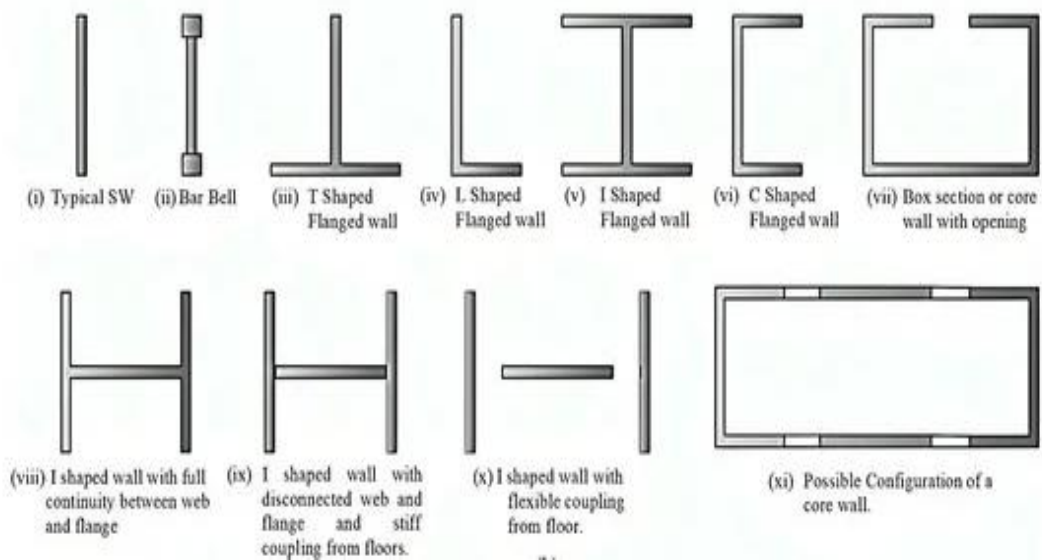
Different Types of Shear Walls & Steel Bracing Section
